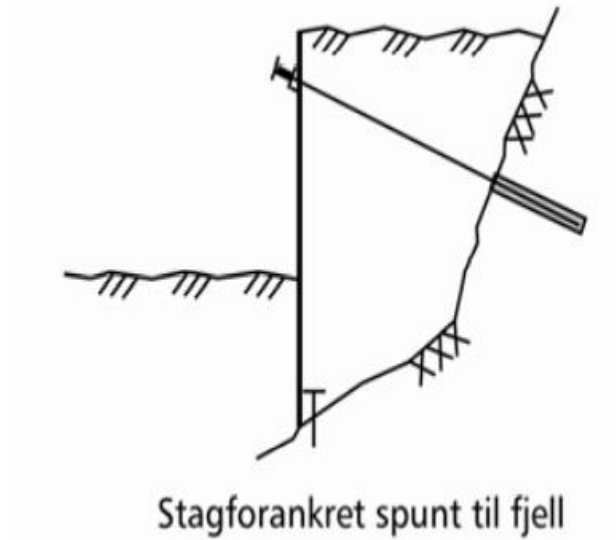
anchored sheet pile taken from handbook016 page 10-3
